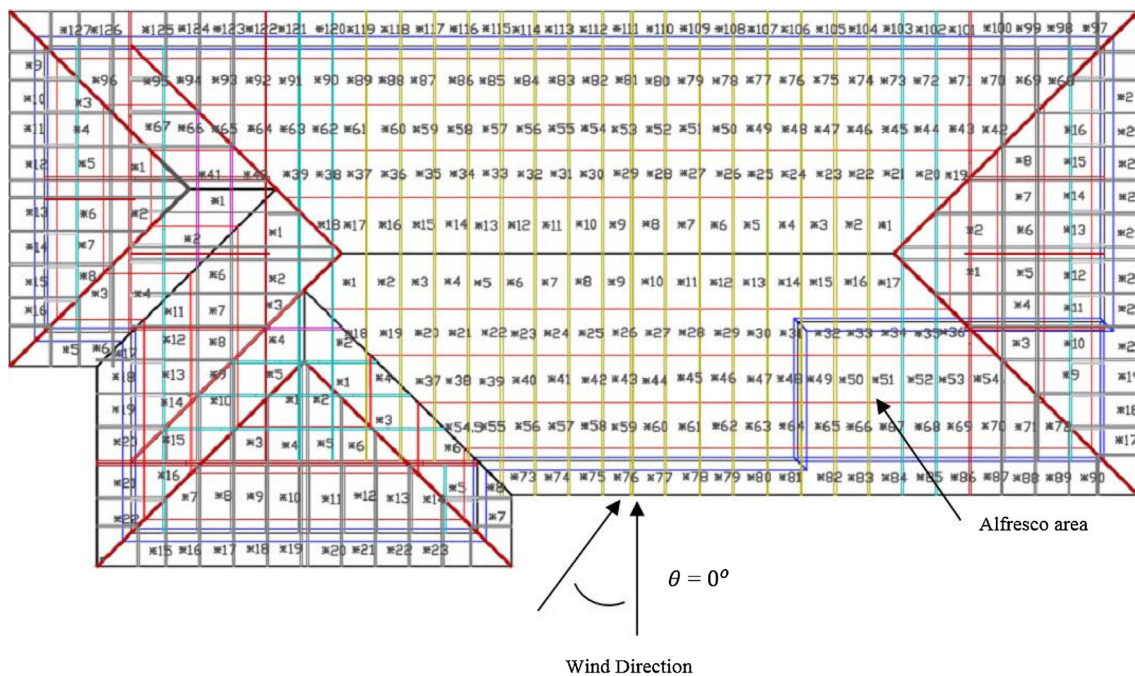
Layout of pressure taps superimposed on roof framing plan.
